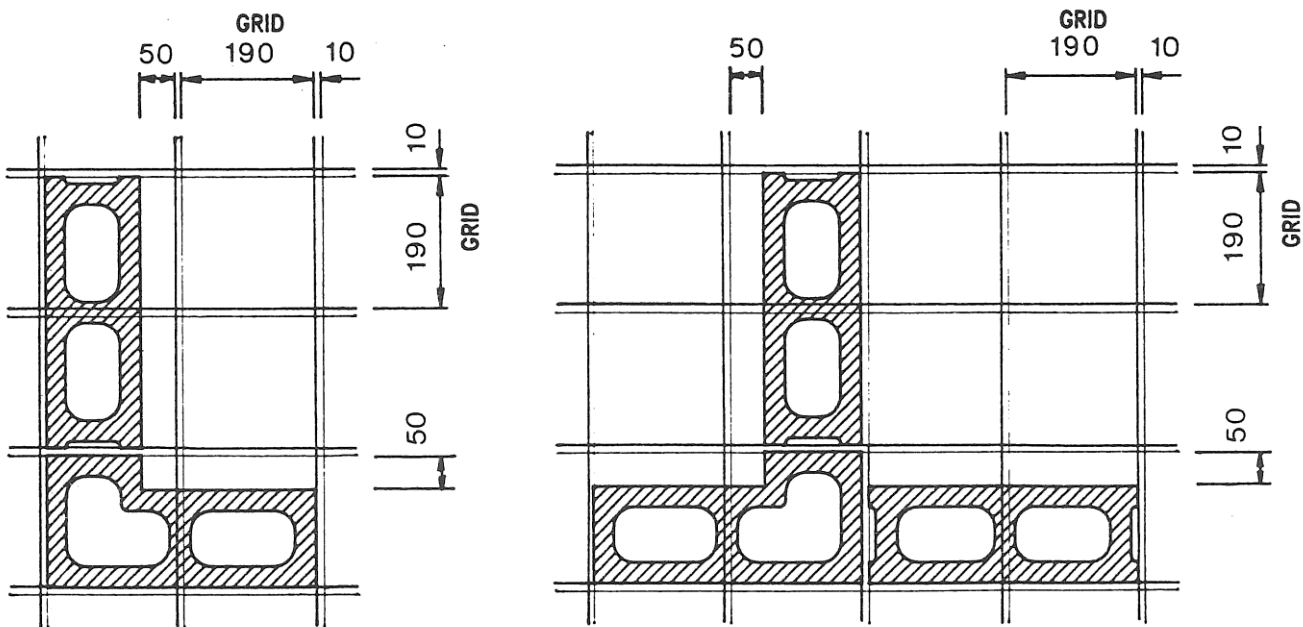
(a): Enlarged Details of the Corner and Interior Wall of the 15 Series
